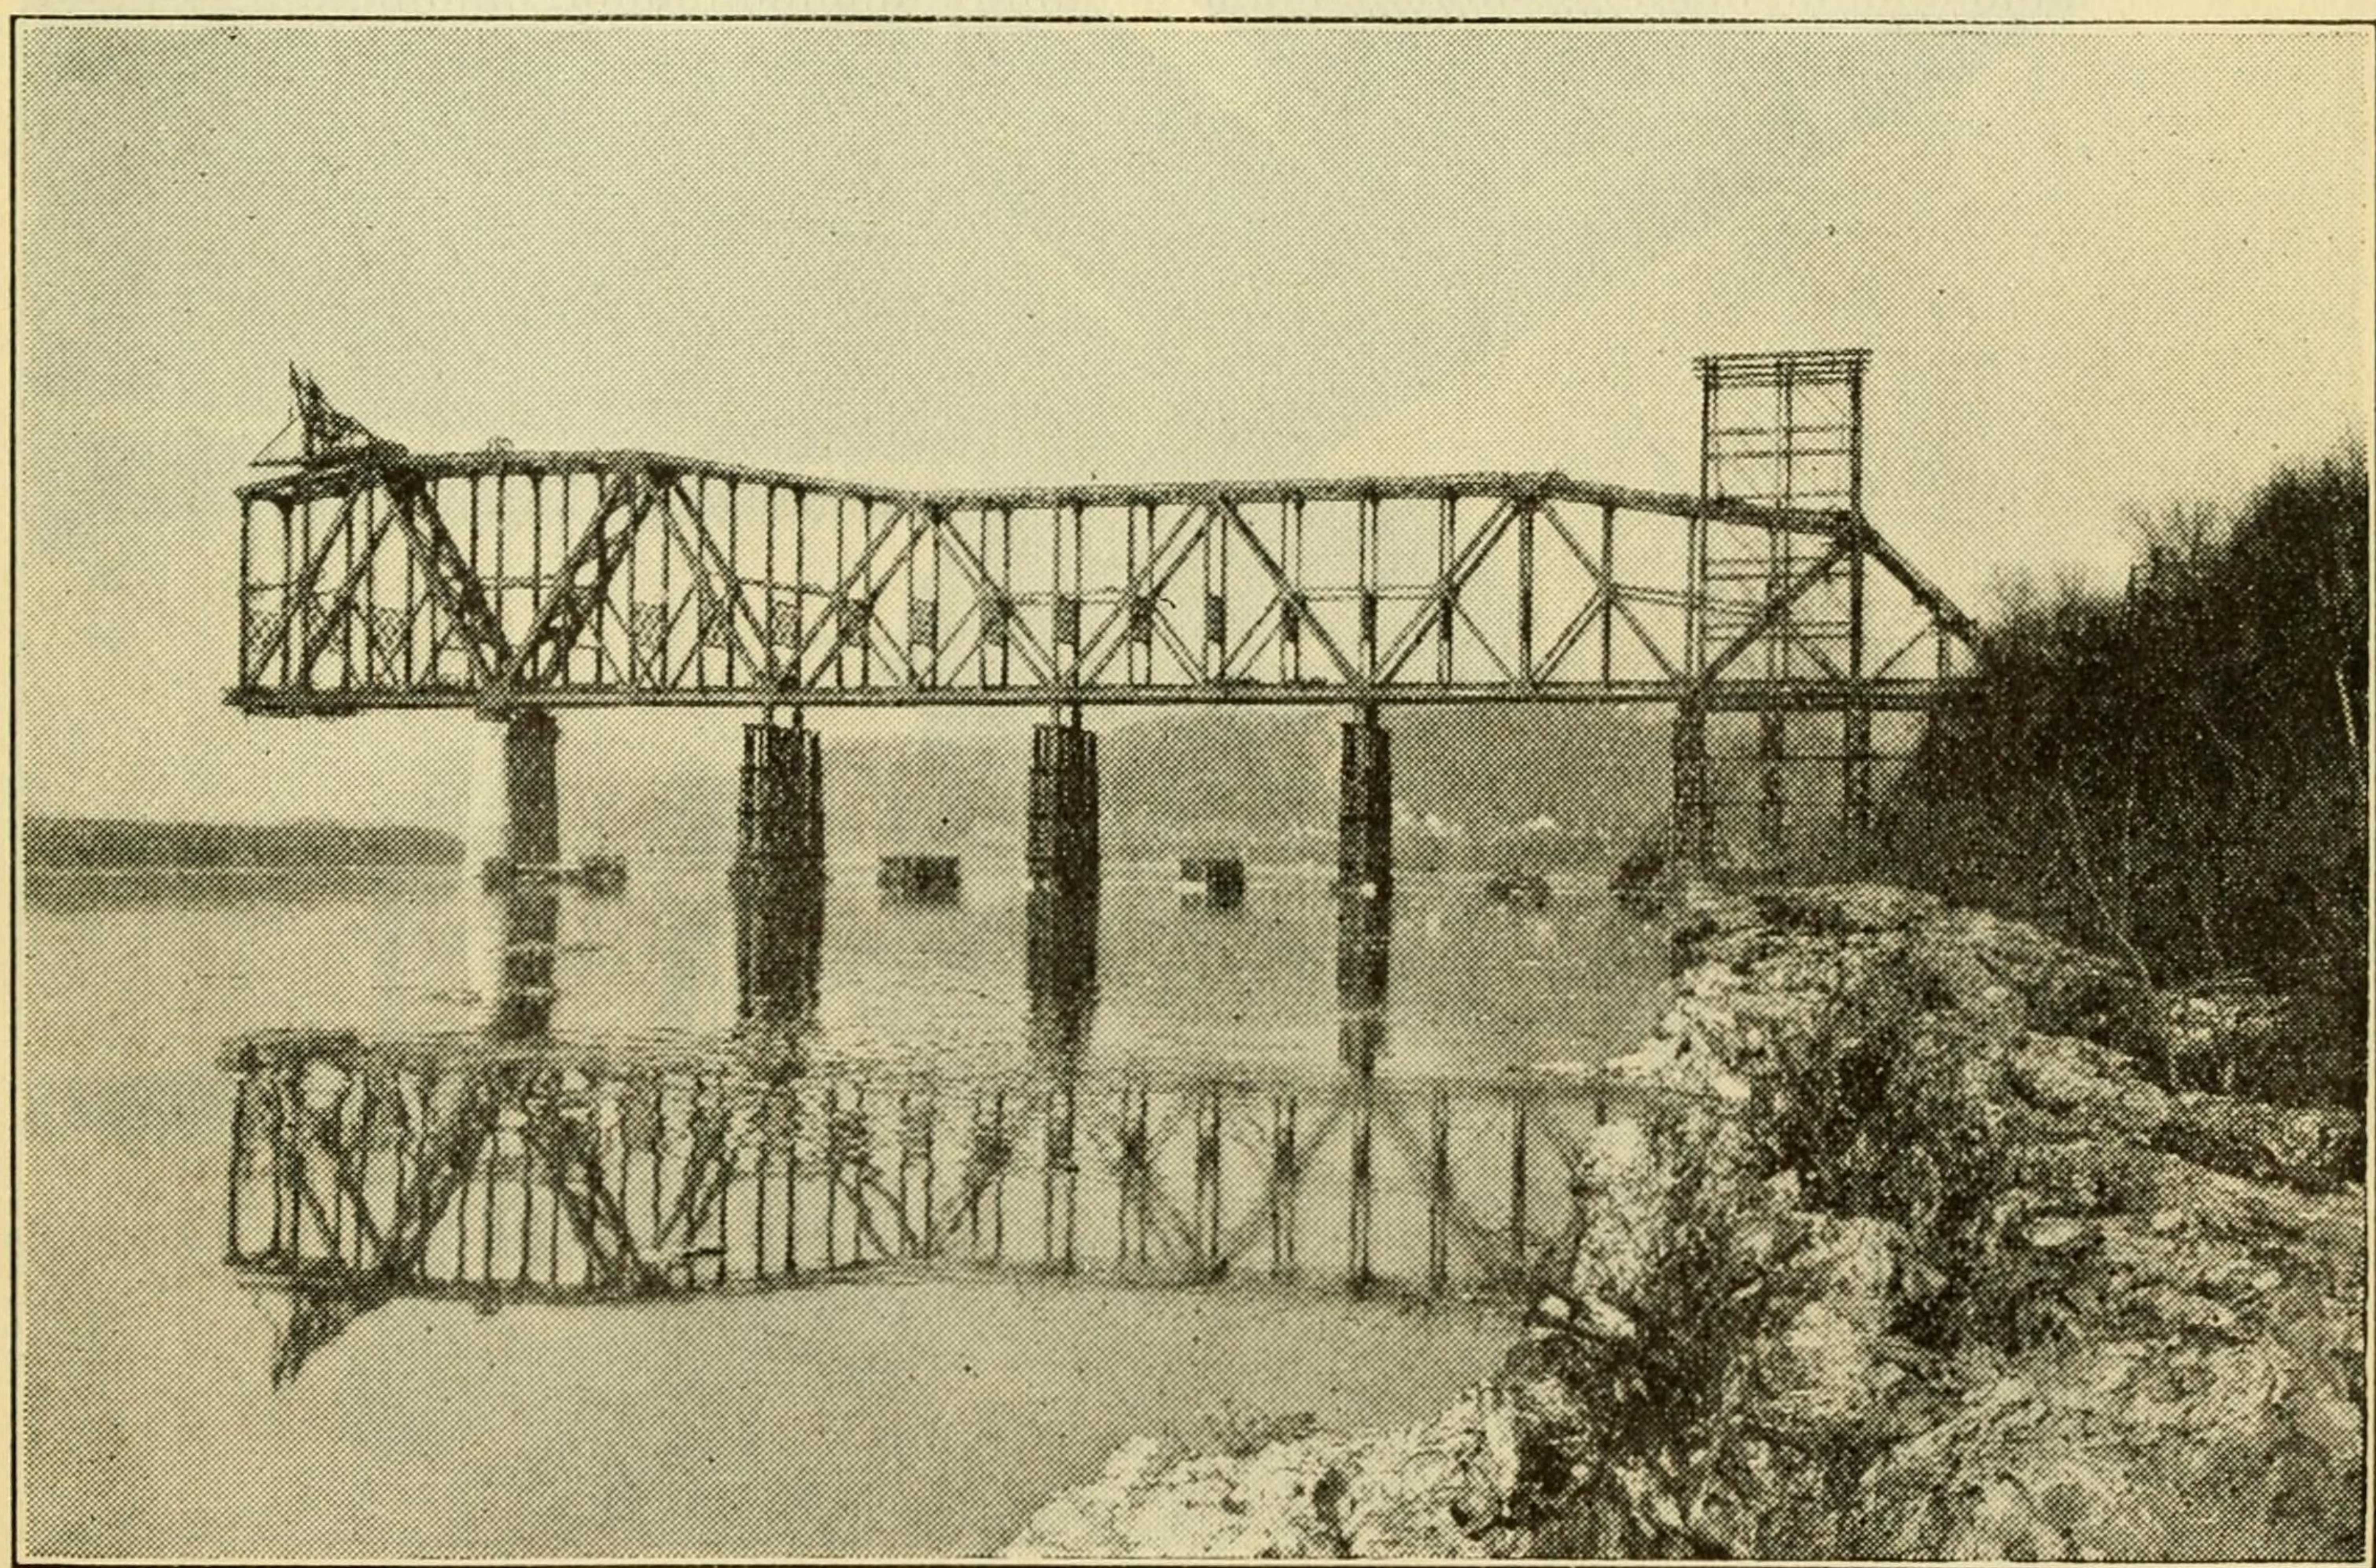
ERECTION OF OHIO SPAN COMPLETED, SCIOTOVILLE BRIDGE.
